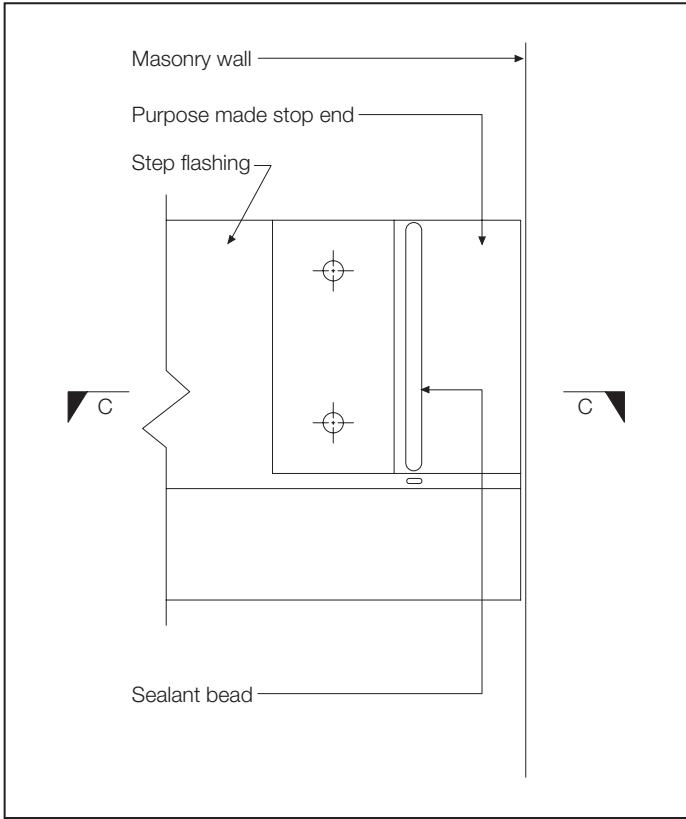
ELEVATION - STEP FLASHING INTO MASONRY WALL
